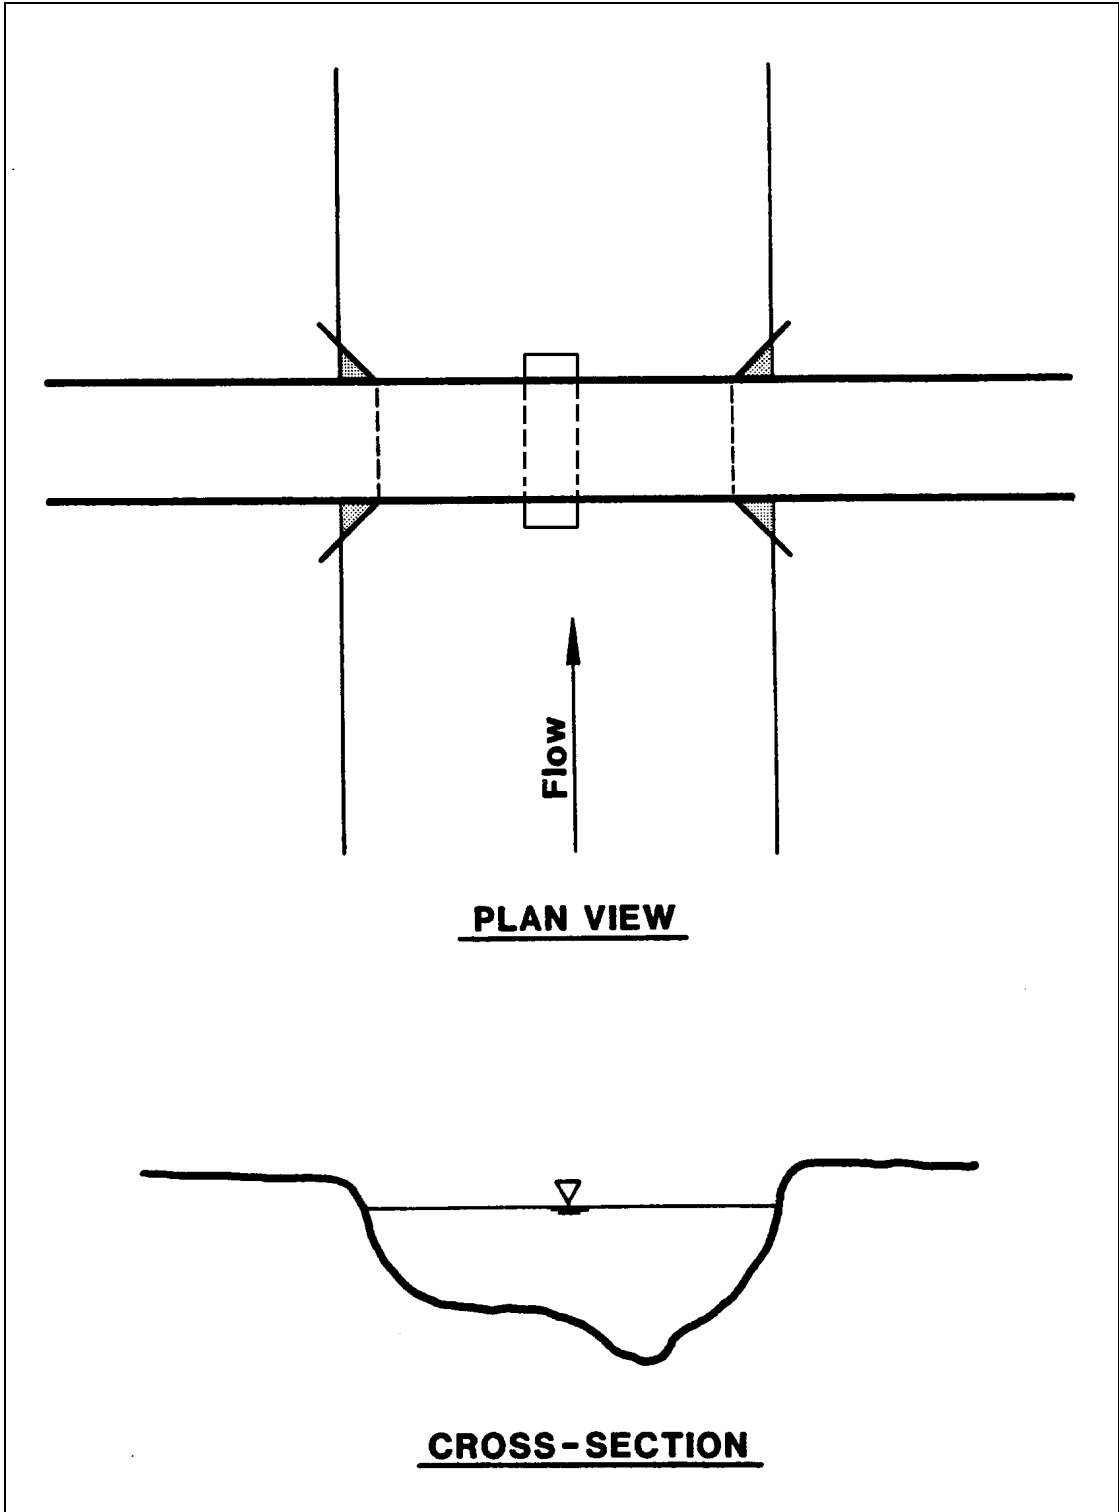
Case 2B: Bridge abutments and/or piers constrict flow.
